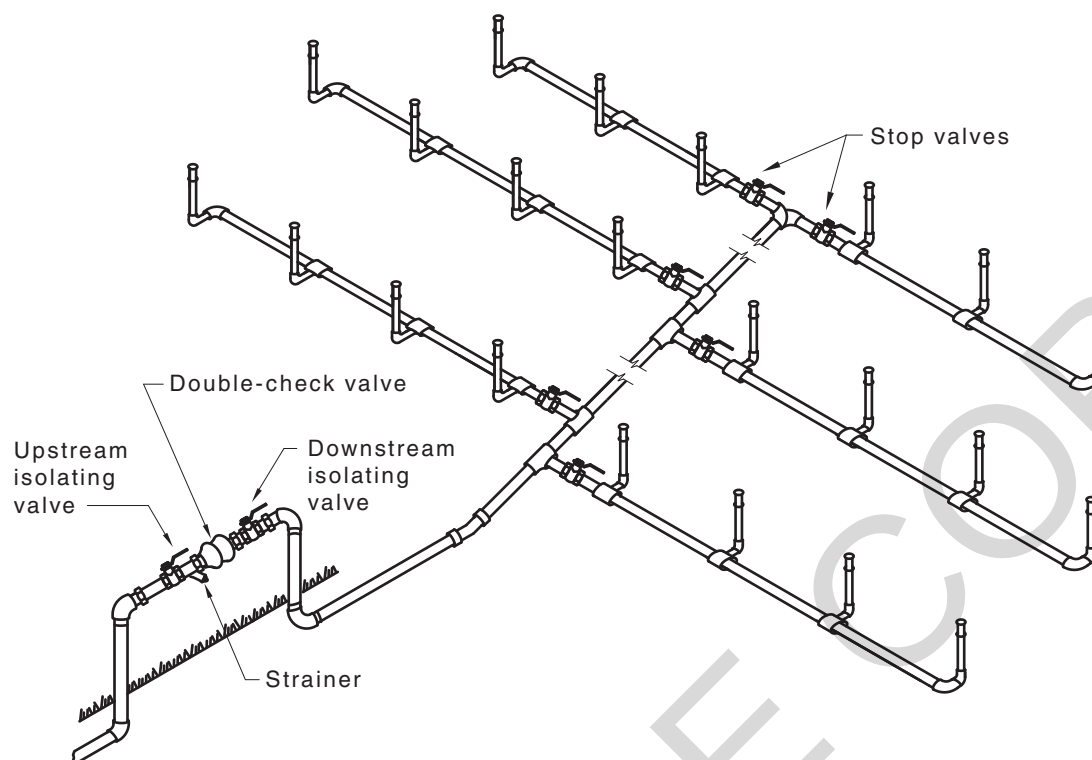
(E) TYPE C SYSTEM—TESTABLE DEVICES SUBJECT TO BACK-PRESSURE OR NO BACK-PRESSURE FOR HILLSIDE OR MULTI-ZONE SYSTEM—DOUBLE CHECK VALVE ASSEMBLY
